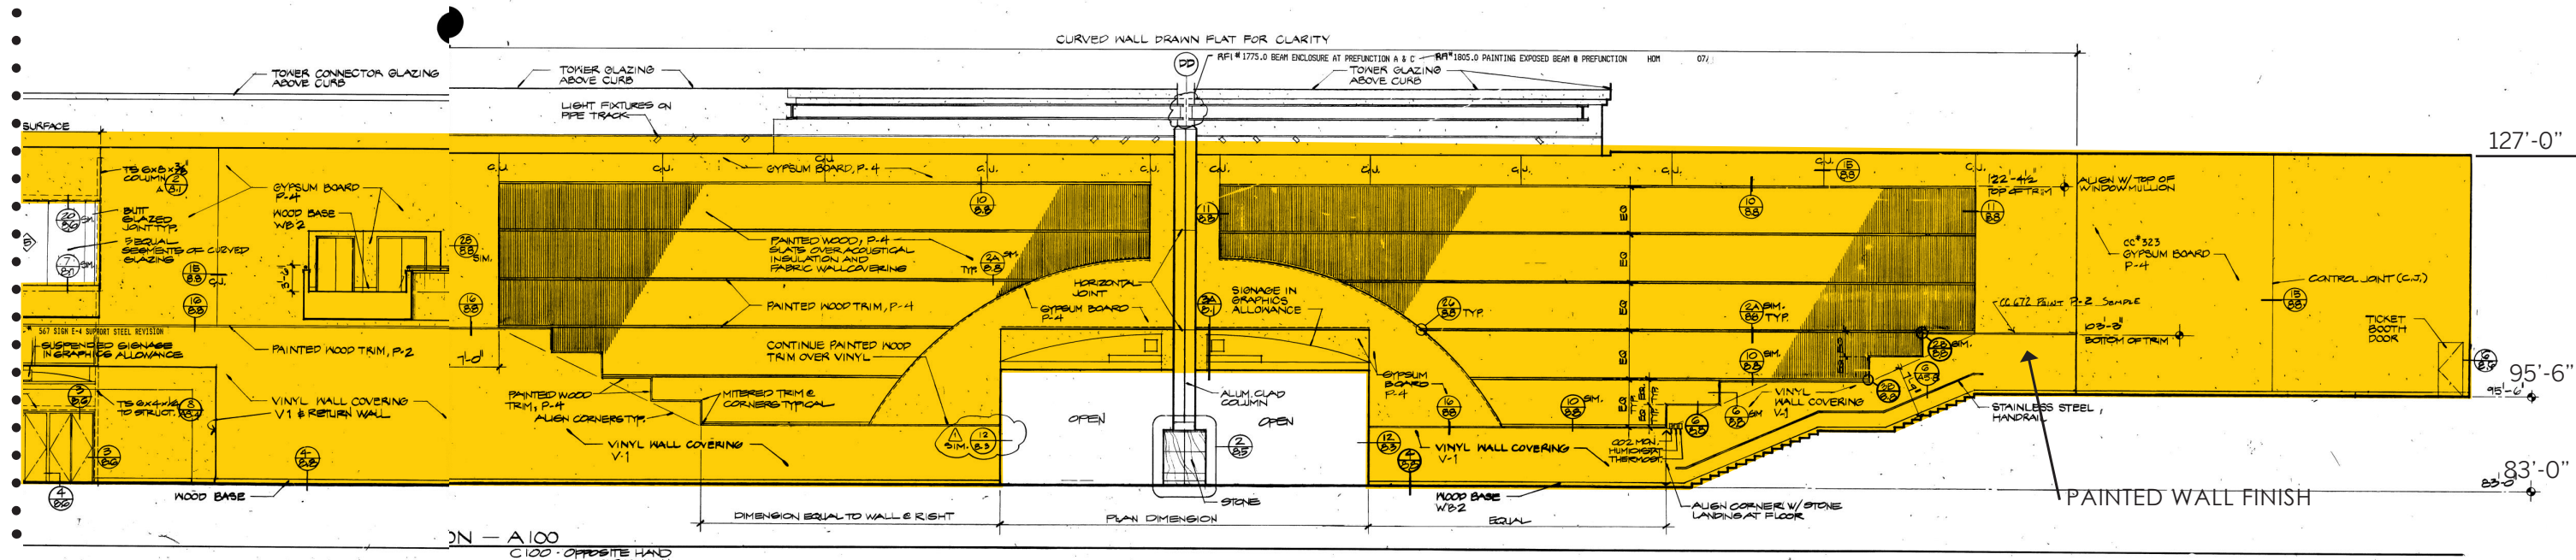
EXHIBIT HALL PRE FUNCTION ELEVATION LOOKING TOWARDS EXHIBIT HALLS - NORTH HALF, SOUTH IS THE SAME.
